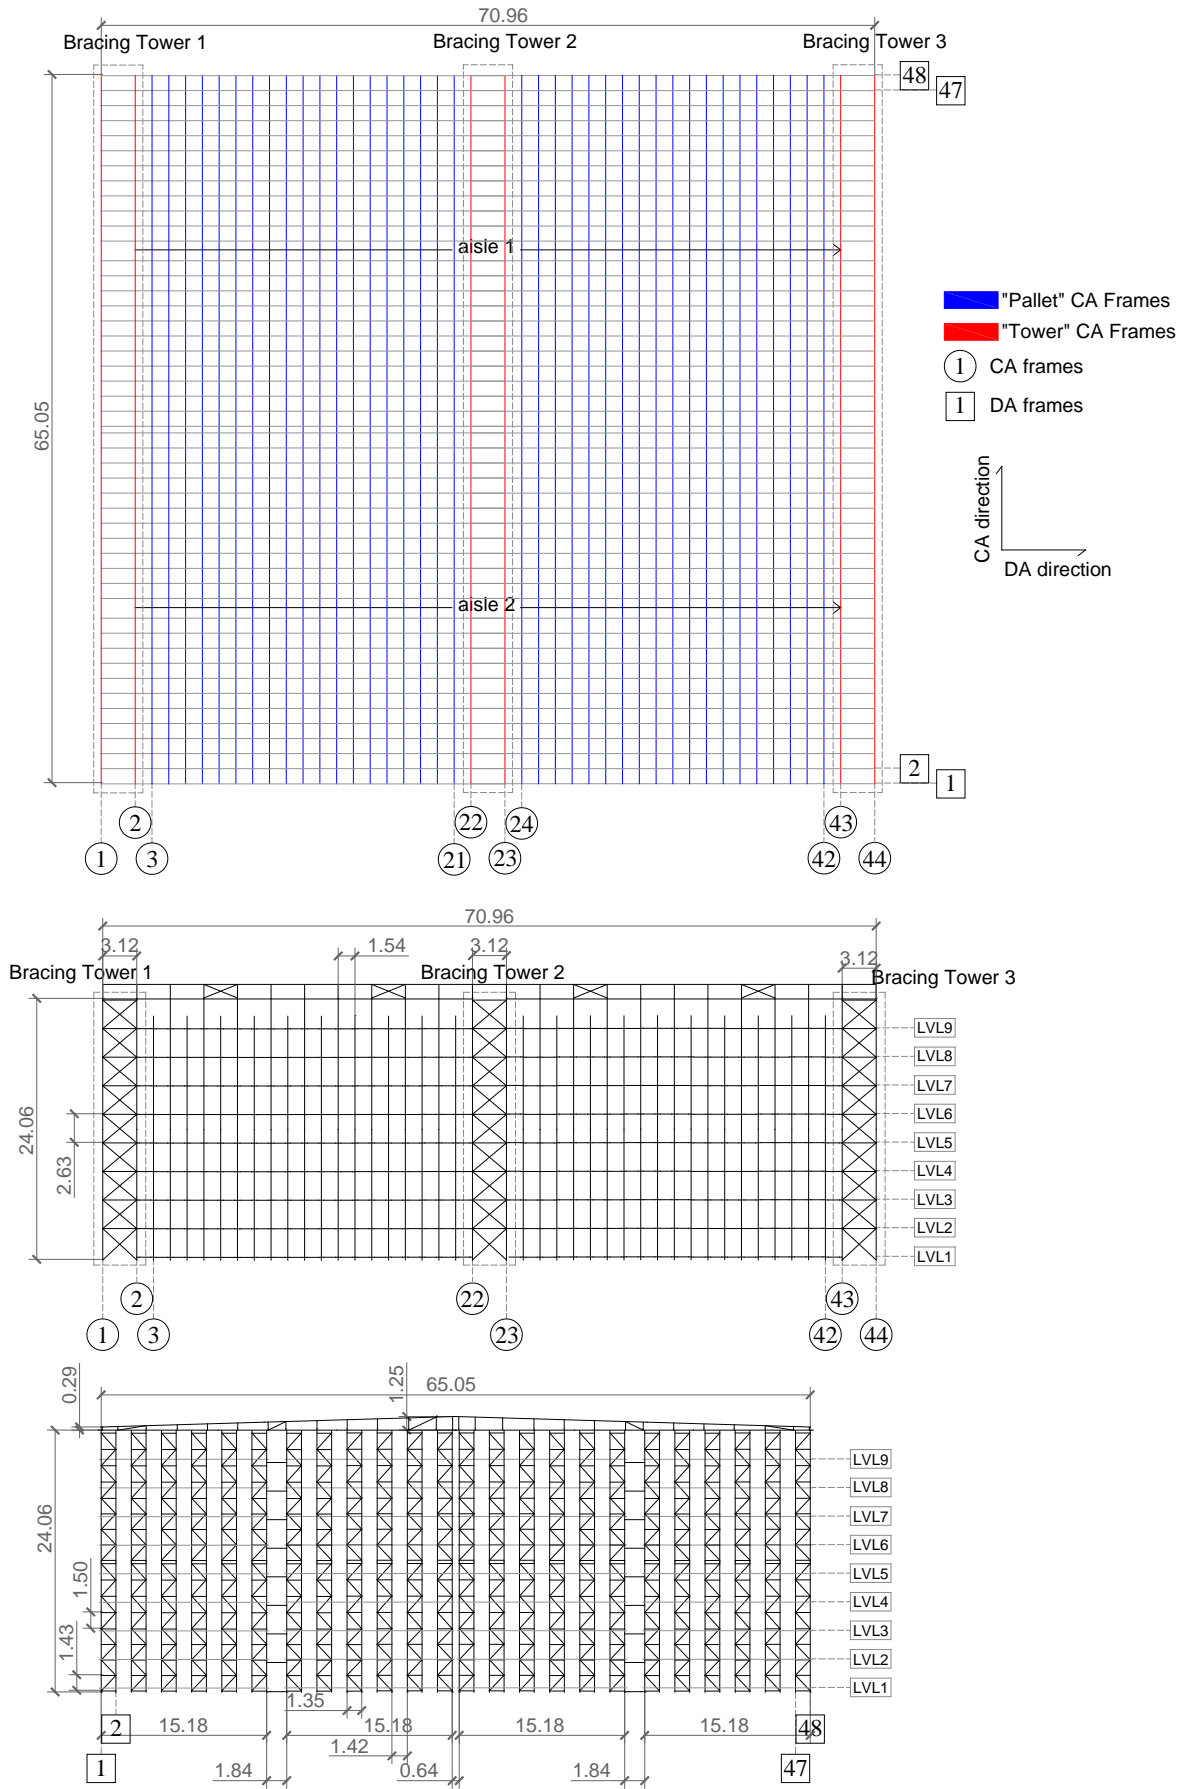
Structural configuration of CS2, showing plan, down- and cross-aisle views.
